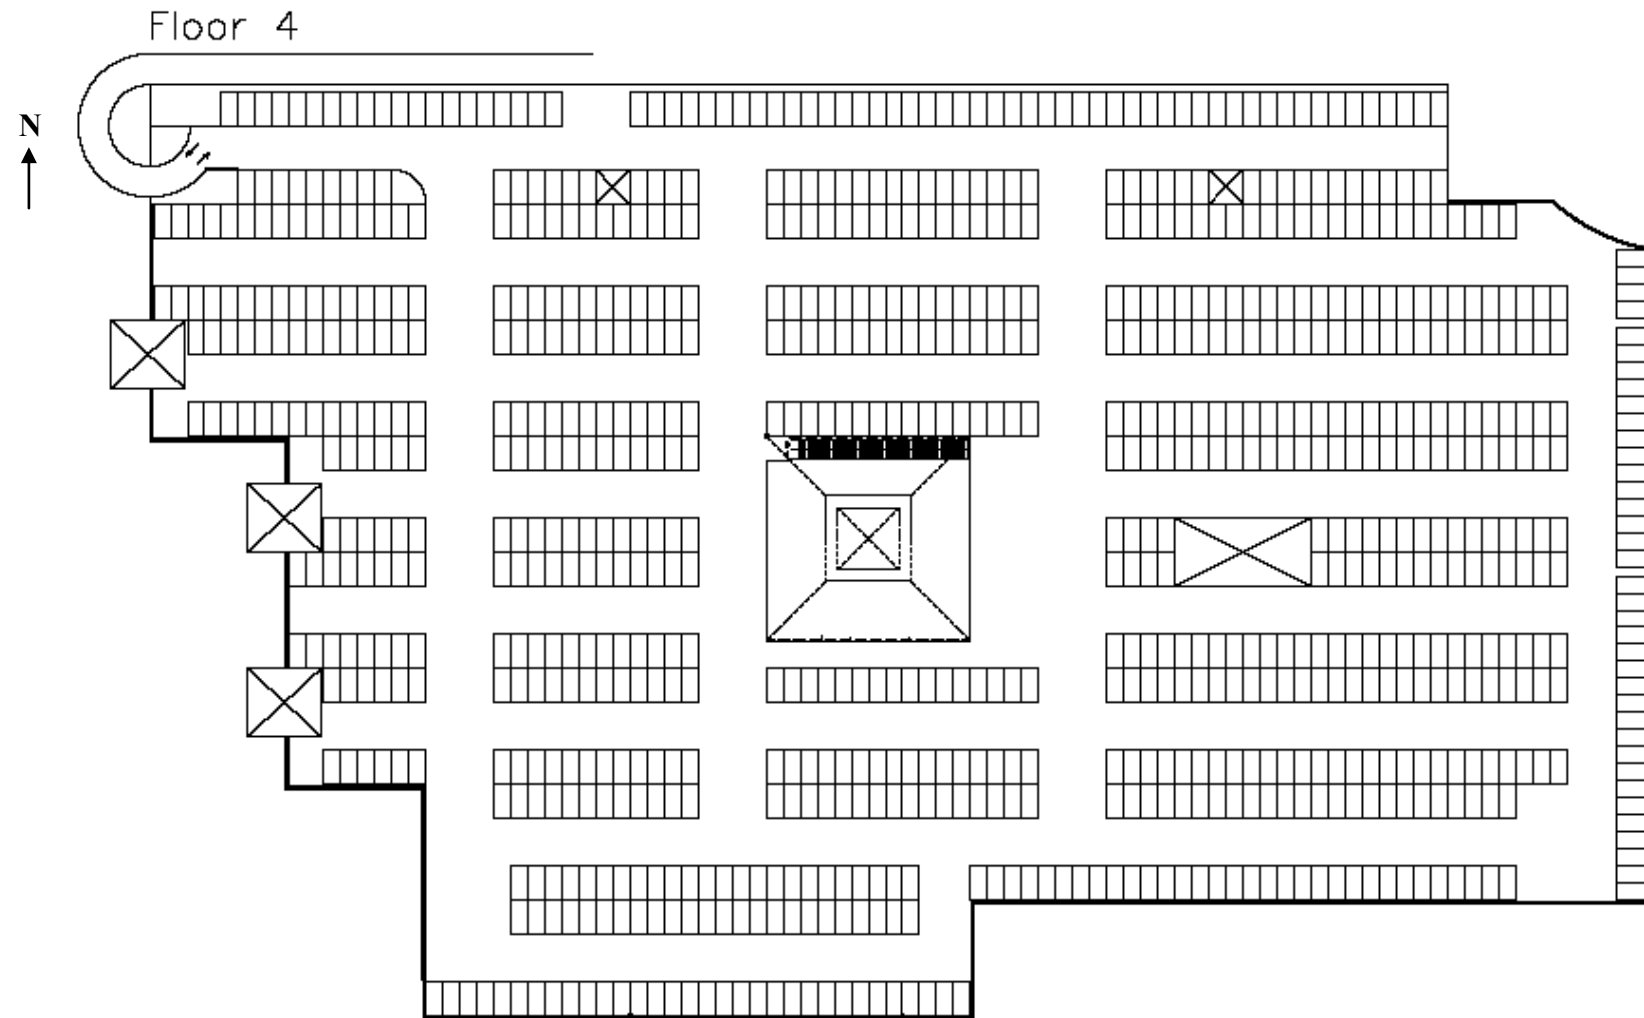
Original Shopping Mall Building Plan – Floor 4
